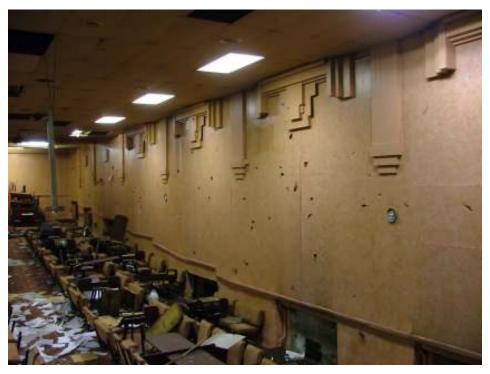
North wall of the auditorium showing the base of the architectural detail, the rest of which is hidden by the suspended ceiling
